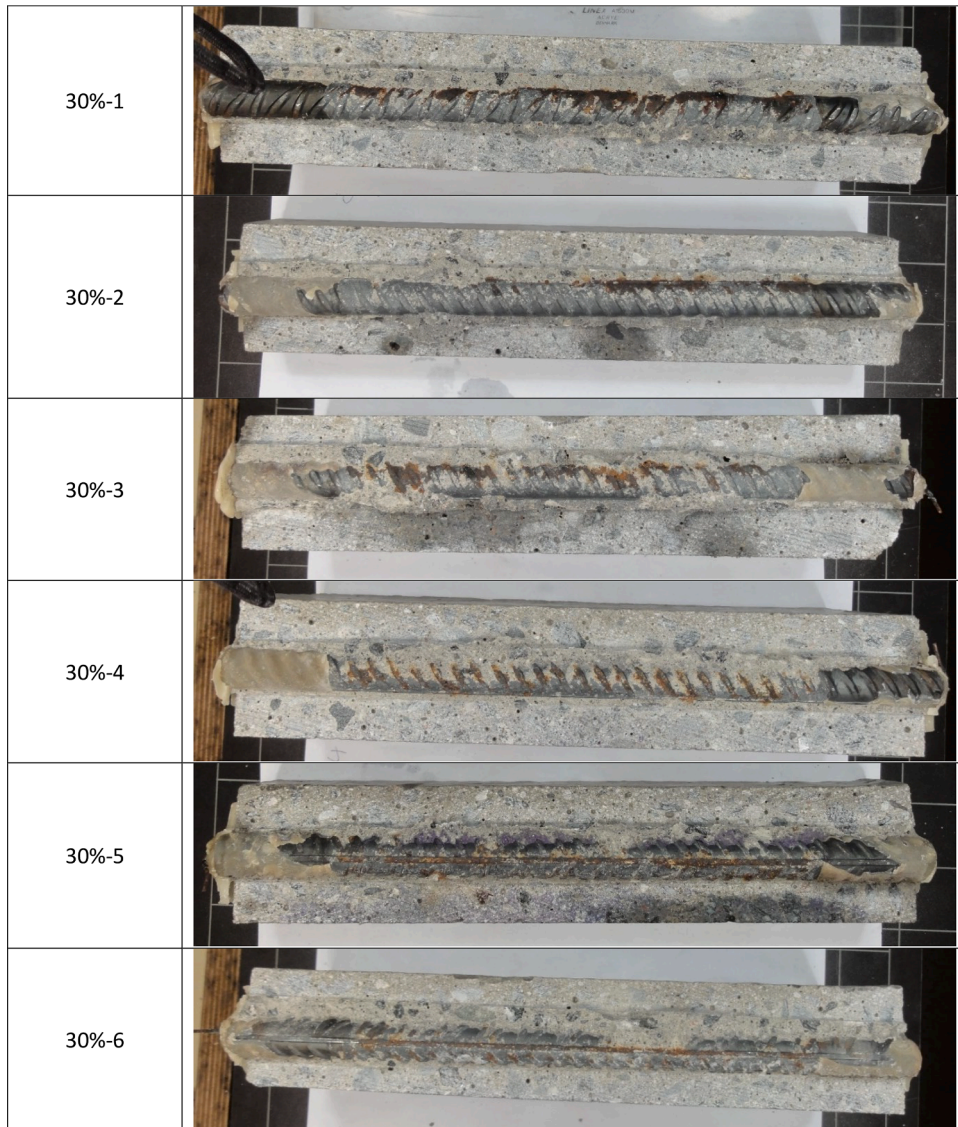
Longitudinal cut along reinforcement (before removing the reinforcement) of reinforced 30% FA specimen after five years laboratory exposure.
